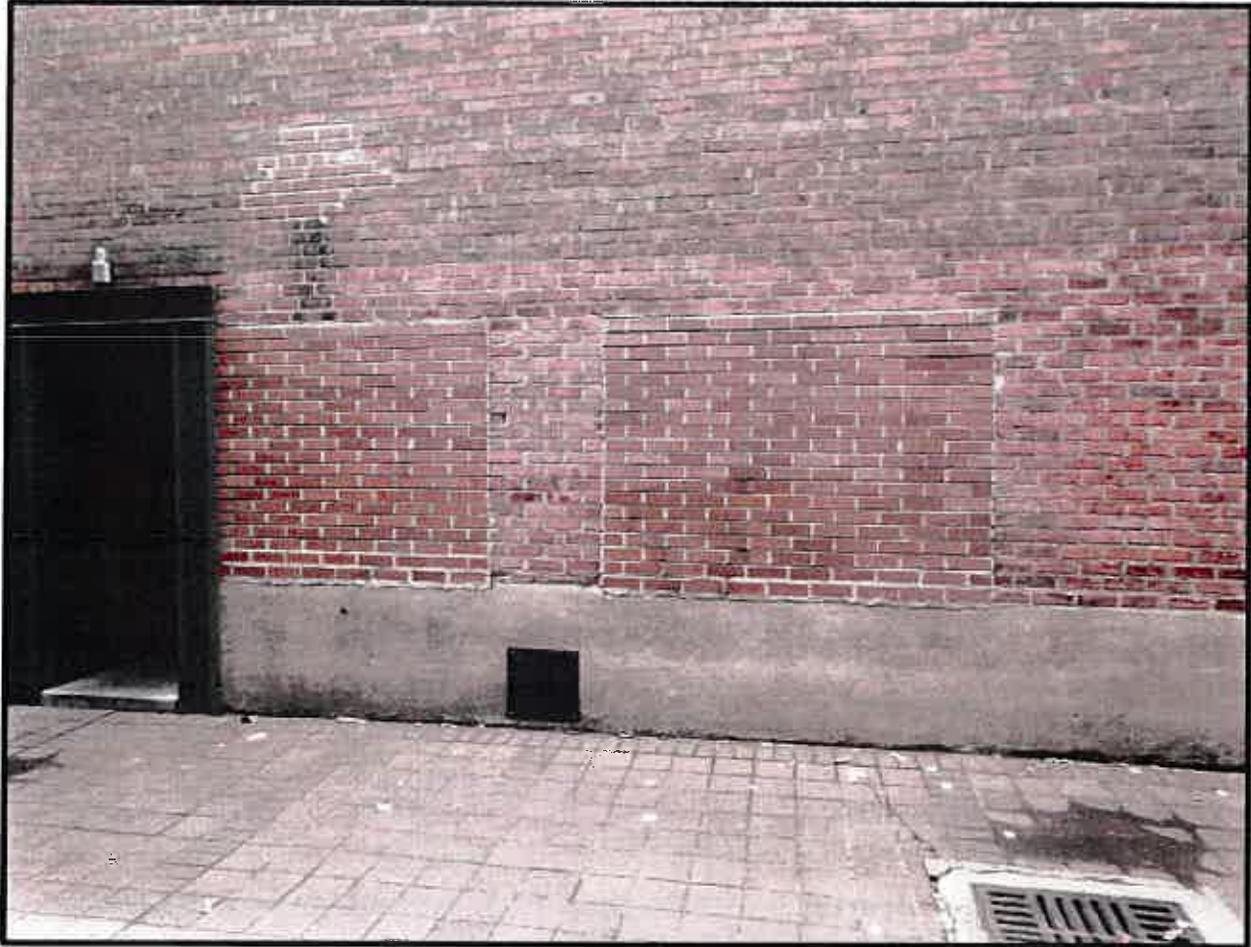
Lower story brick patch, formerly two windows, next to side entrance on the north side of the northeast elevation.
